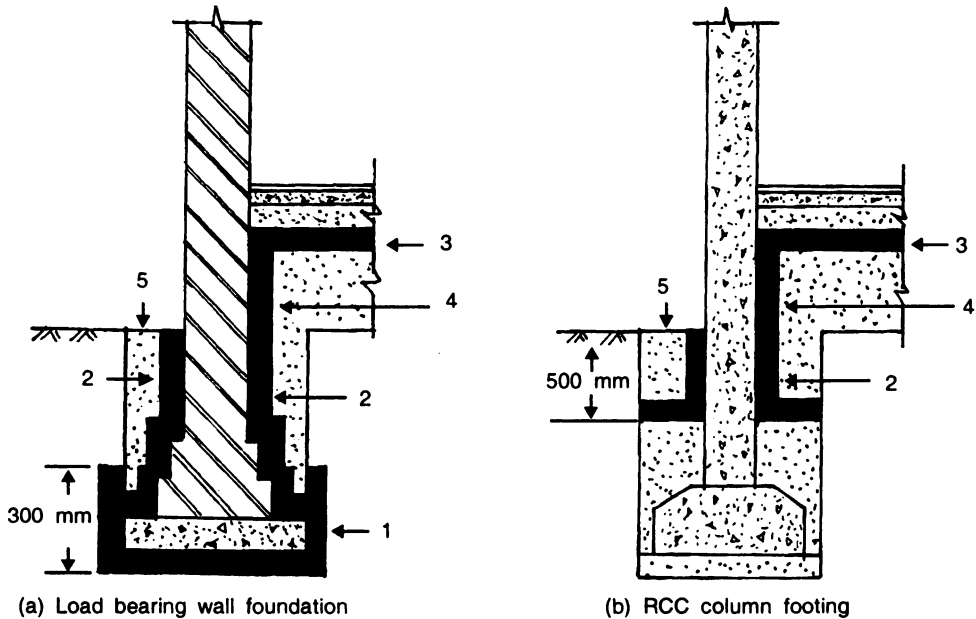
Anti-termite treatment of foundation and earthfill below ground floor.
